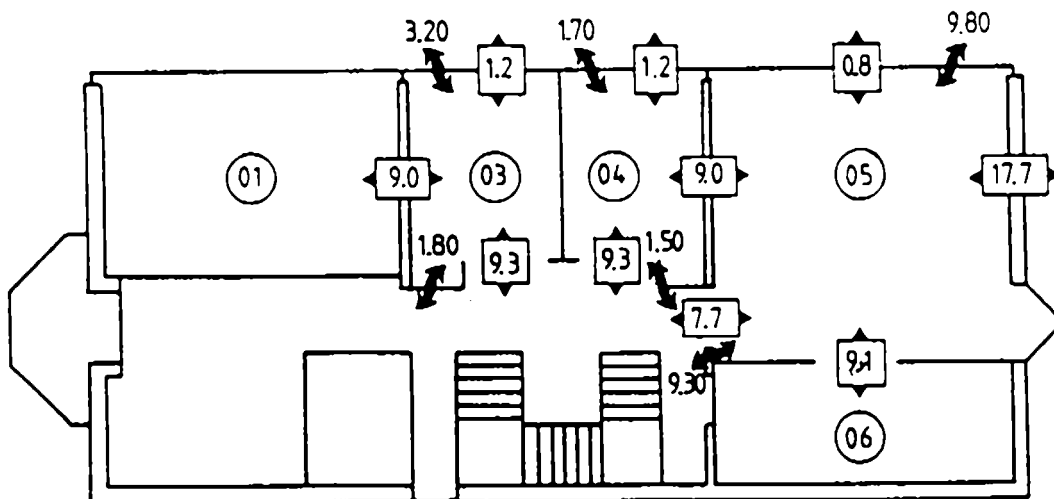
Thermal conductances in [W/K] between rooms and also with outside. First floor.
